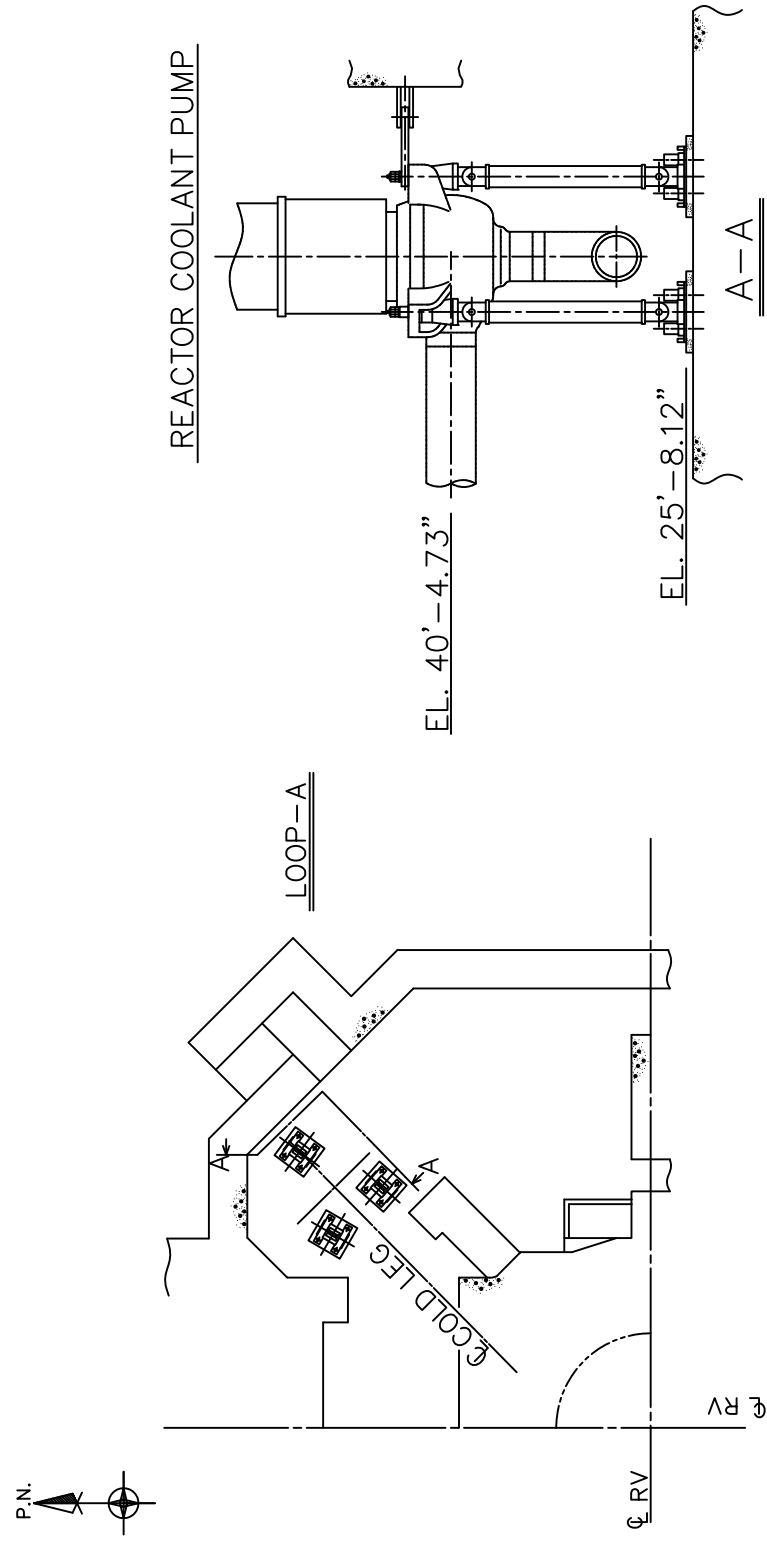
RCP Support System (Sheet 2 of 2)
